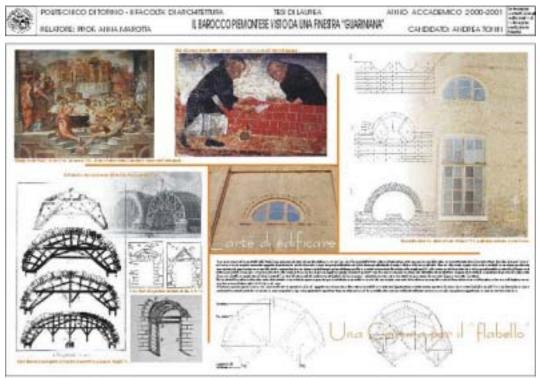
, the constructive technology of building in XVII-XVIII century: build the window
